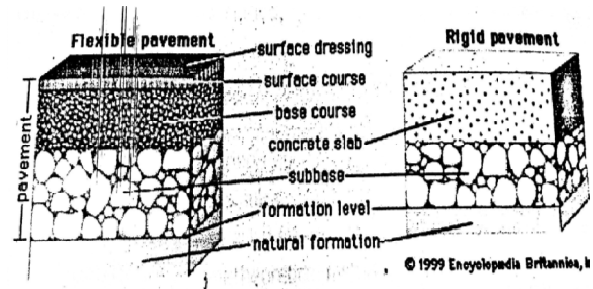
Cross section of Flexible Asphalt-Based Pavements Rigid Portland-cement Concrete Pavement
